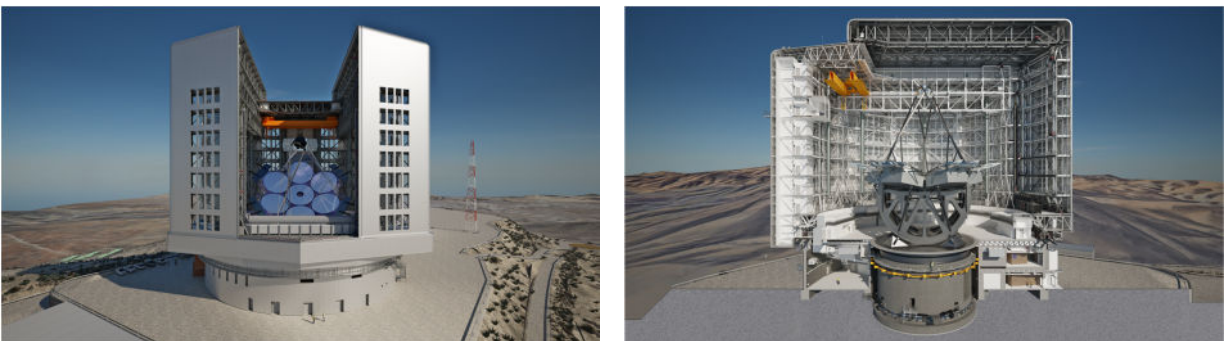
Artist's conception of a face-on view of the open enclosure (left), and a CAD section view showing the full extent of the telescope and pier structure (right). (Renderings courtesy of IDOM)
